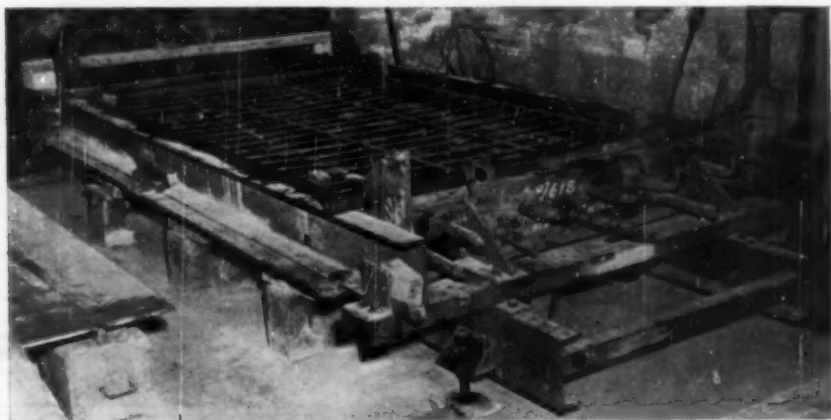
The Reinforcement, Tubes, and Steelwork in a Mould Ready for Concreting.
